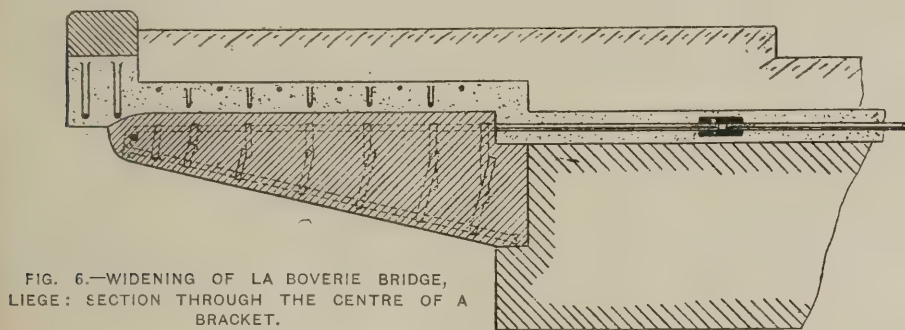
WIDENING OF LA BOVERIE BRIDGE, LIEGE: SECTION THROUGH THE CENTRE OF A BRACKET.
